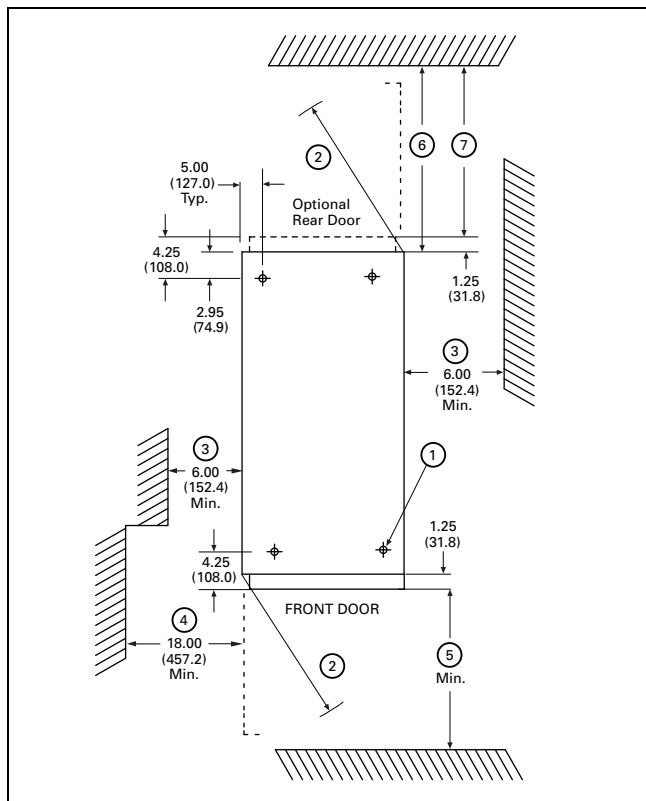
Typical Anchor Plan for MEB, Indoor or Outdoor
